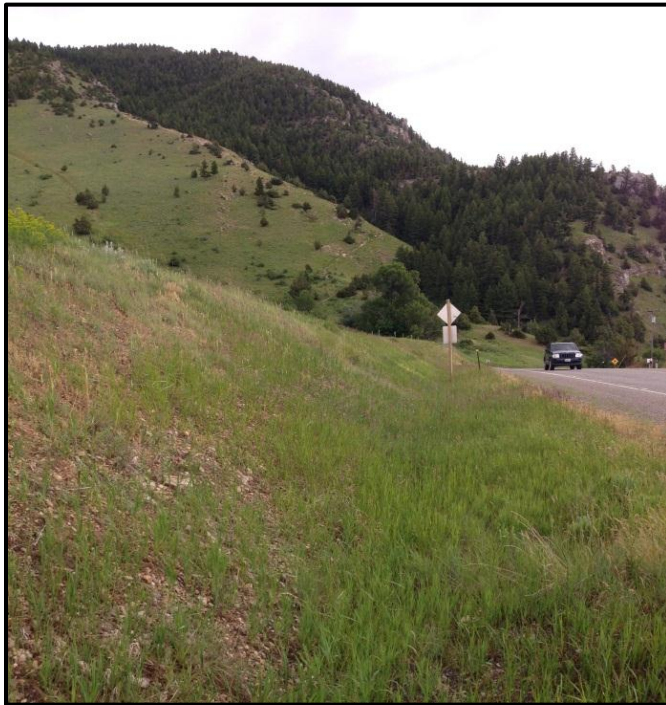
Looking at surface cracks on MT 86. RP 3.2.
